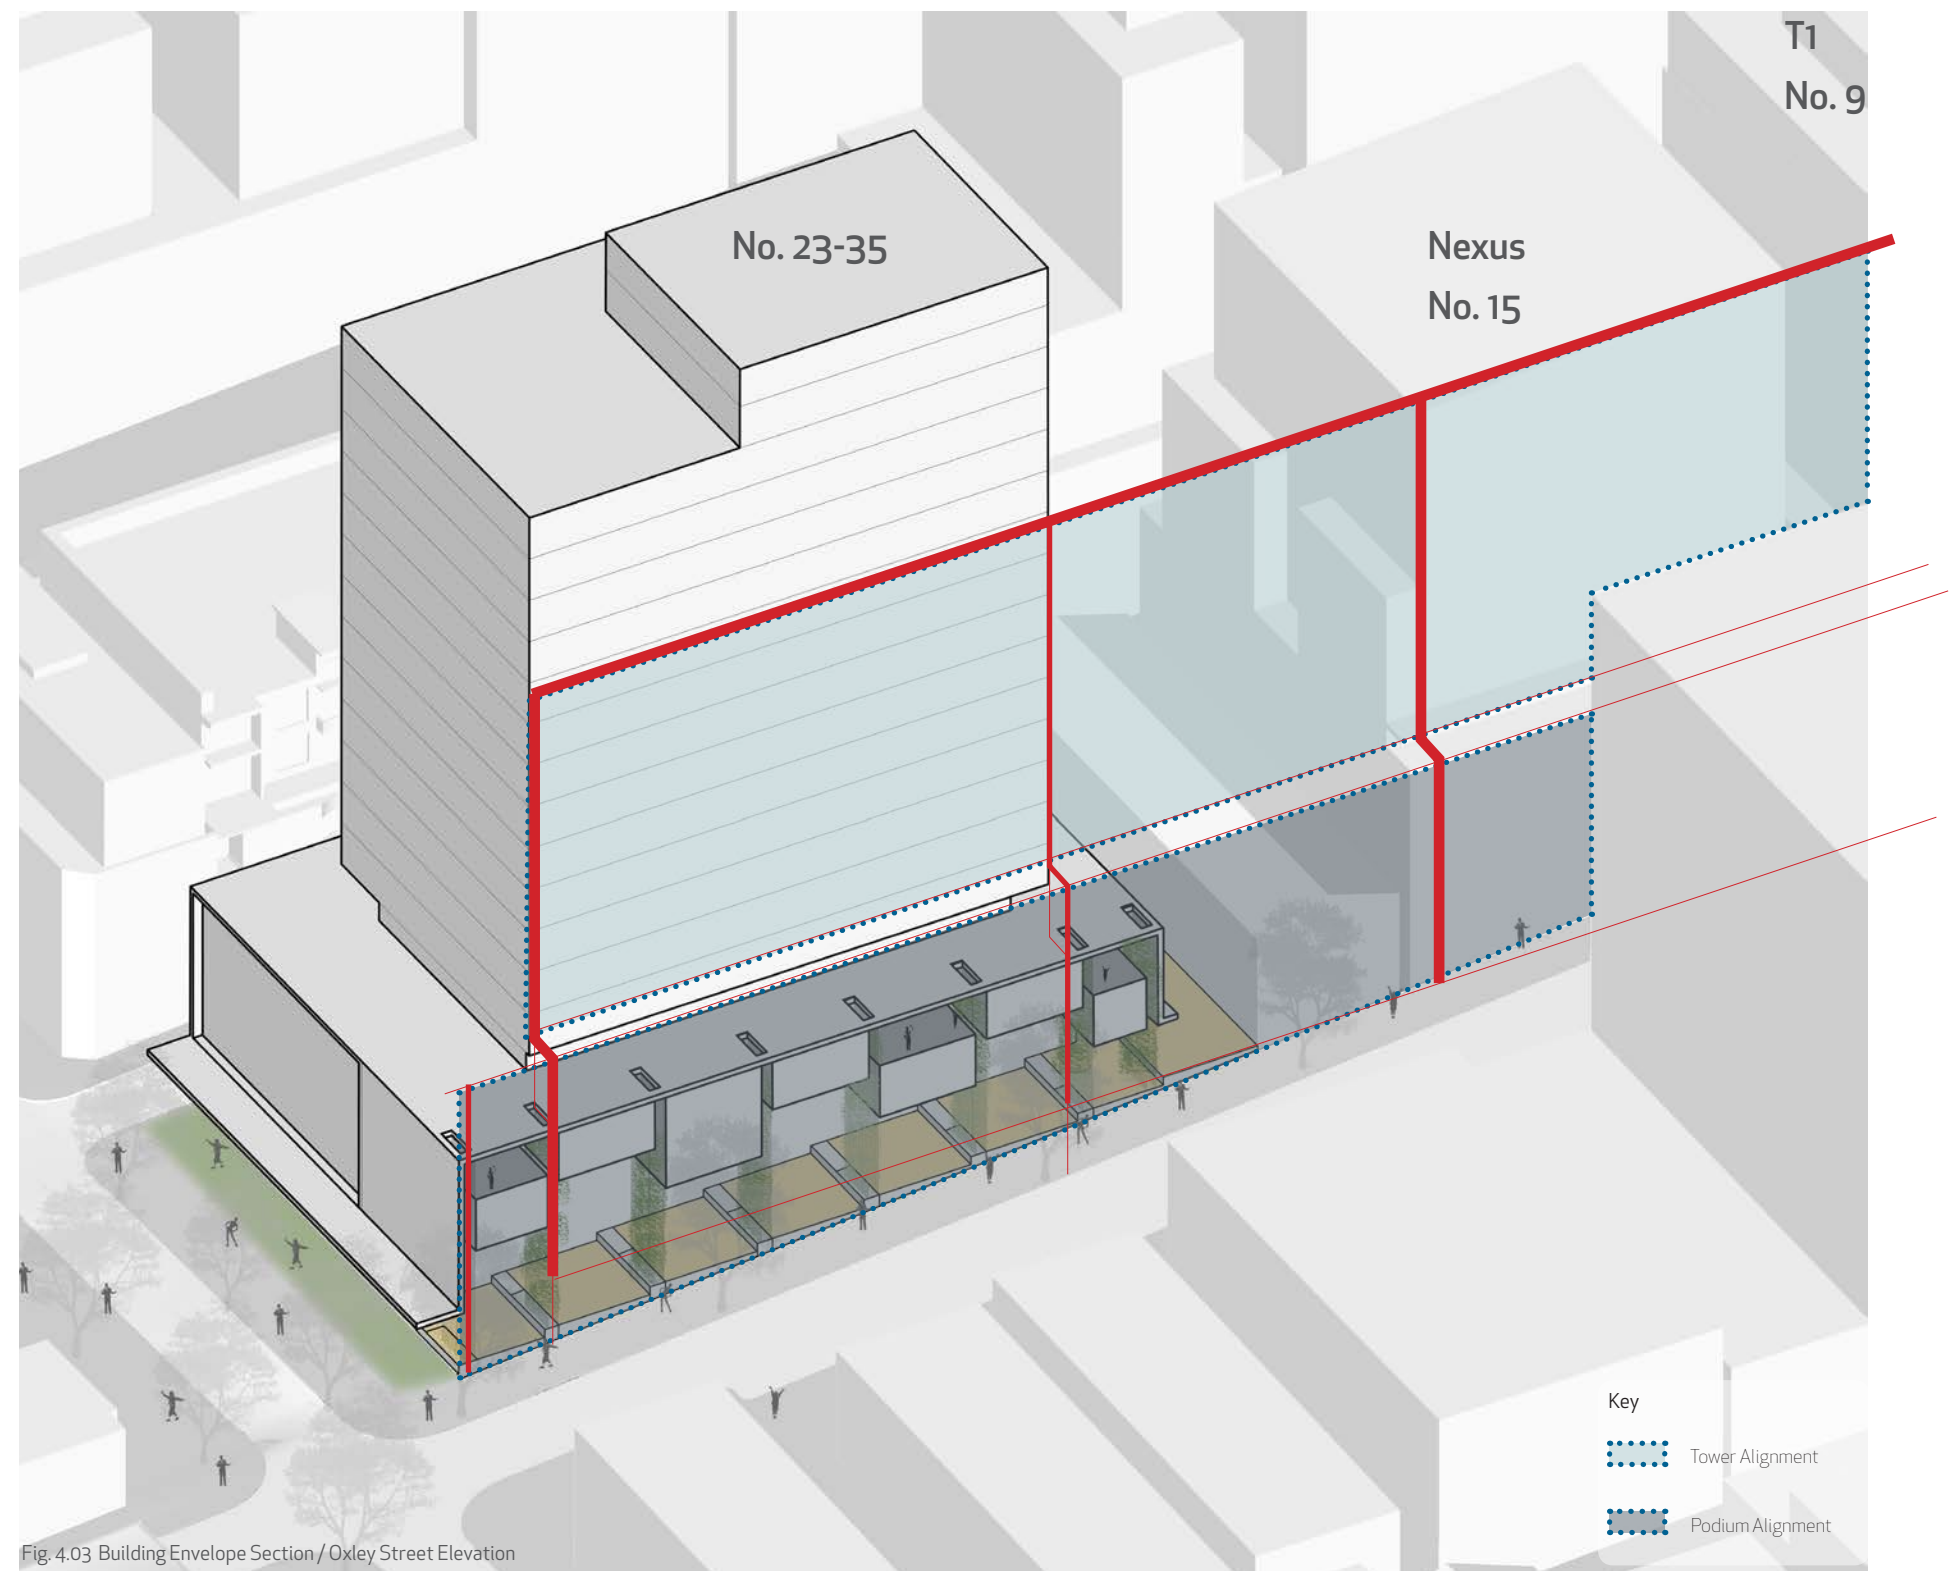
Building Envelope Section / Oxley Street Elevation
